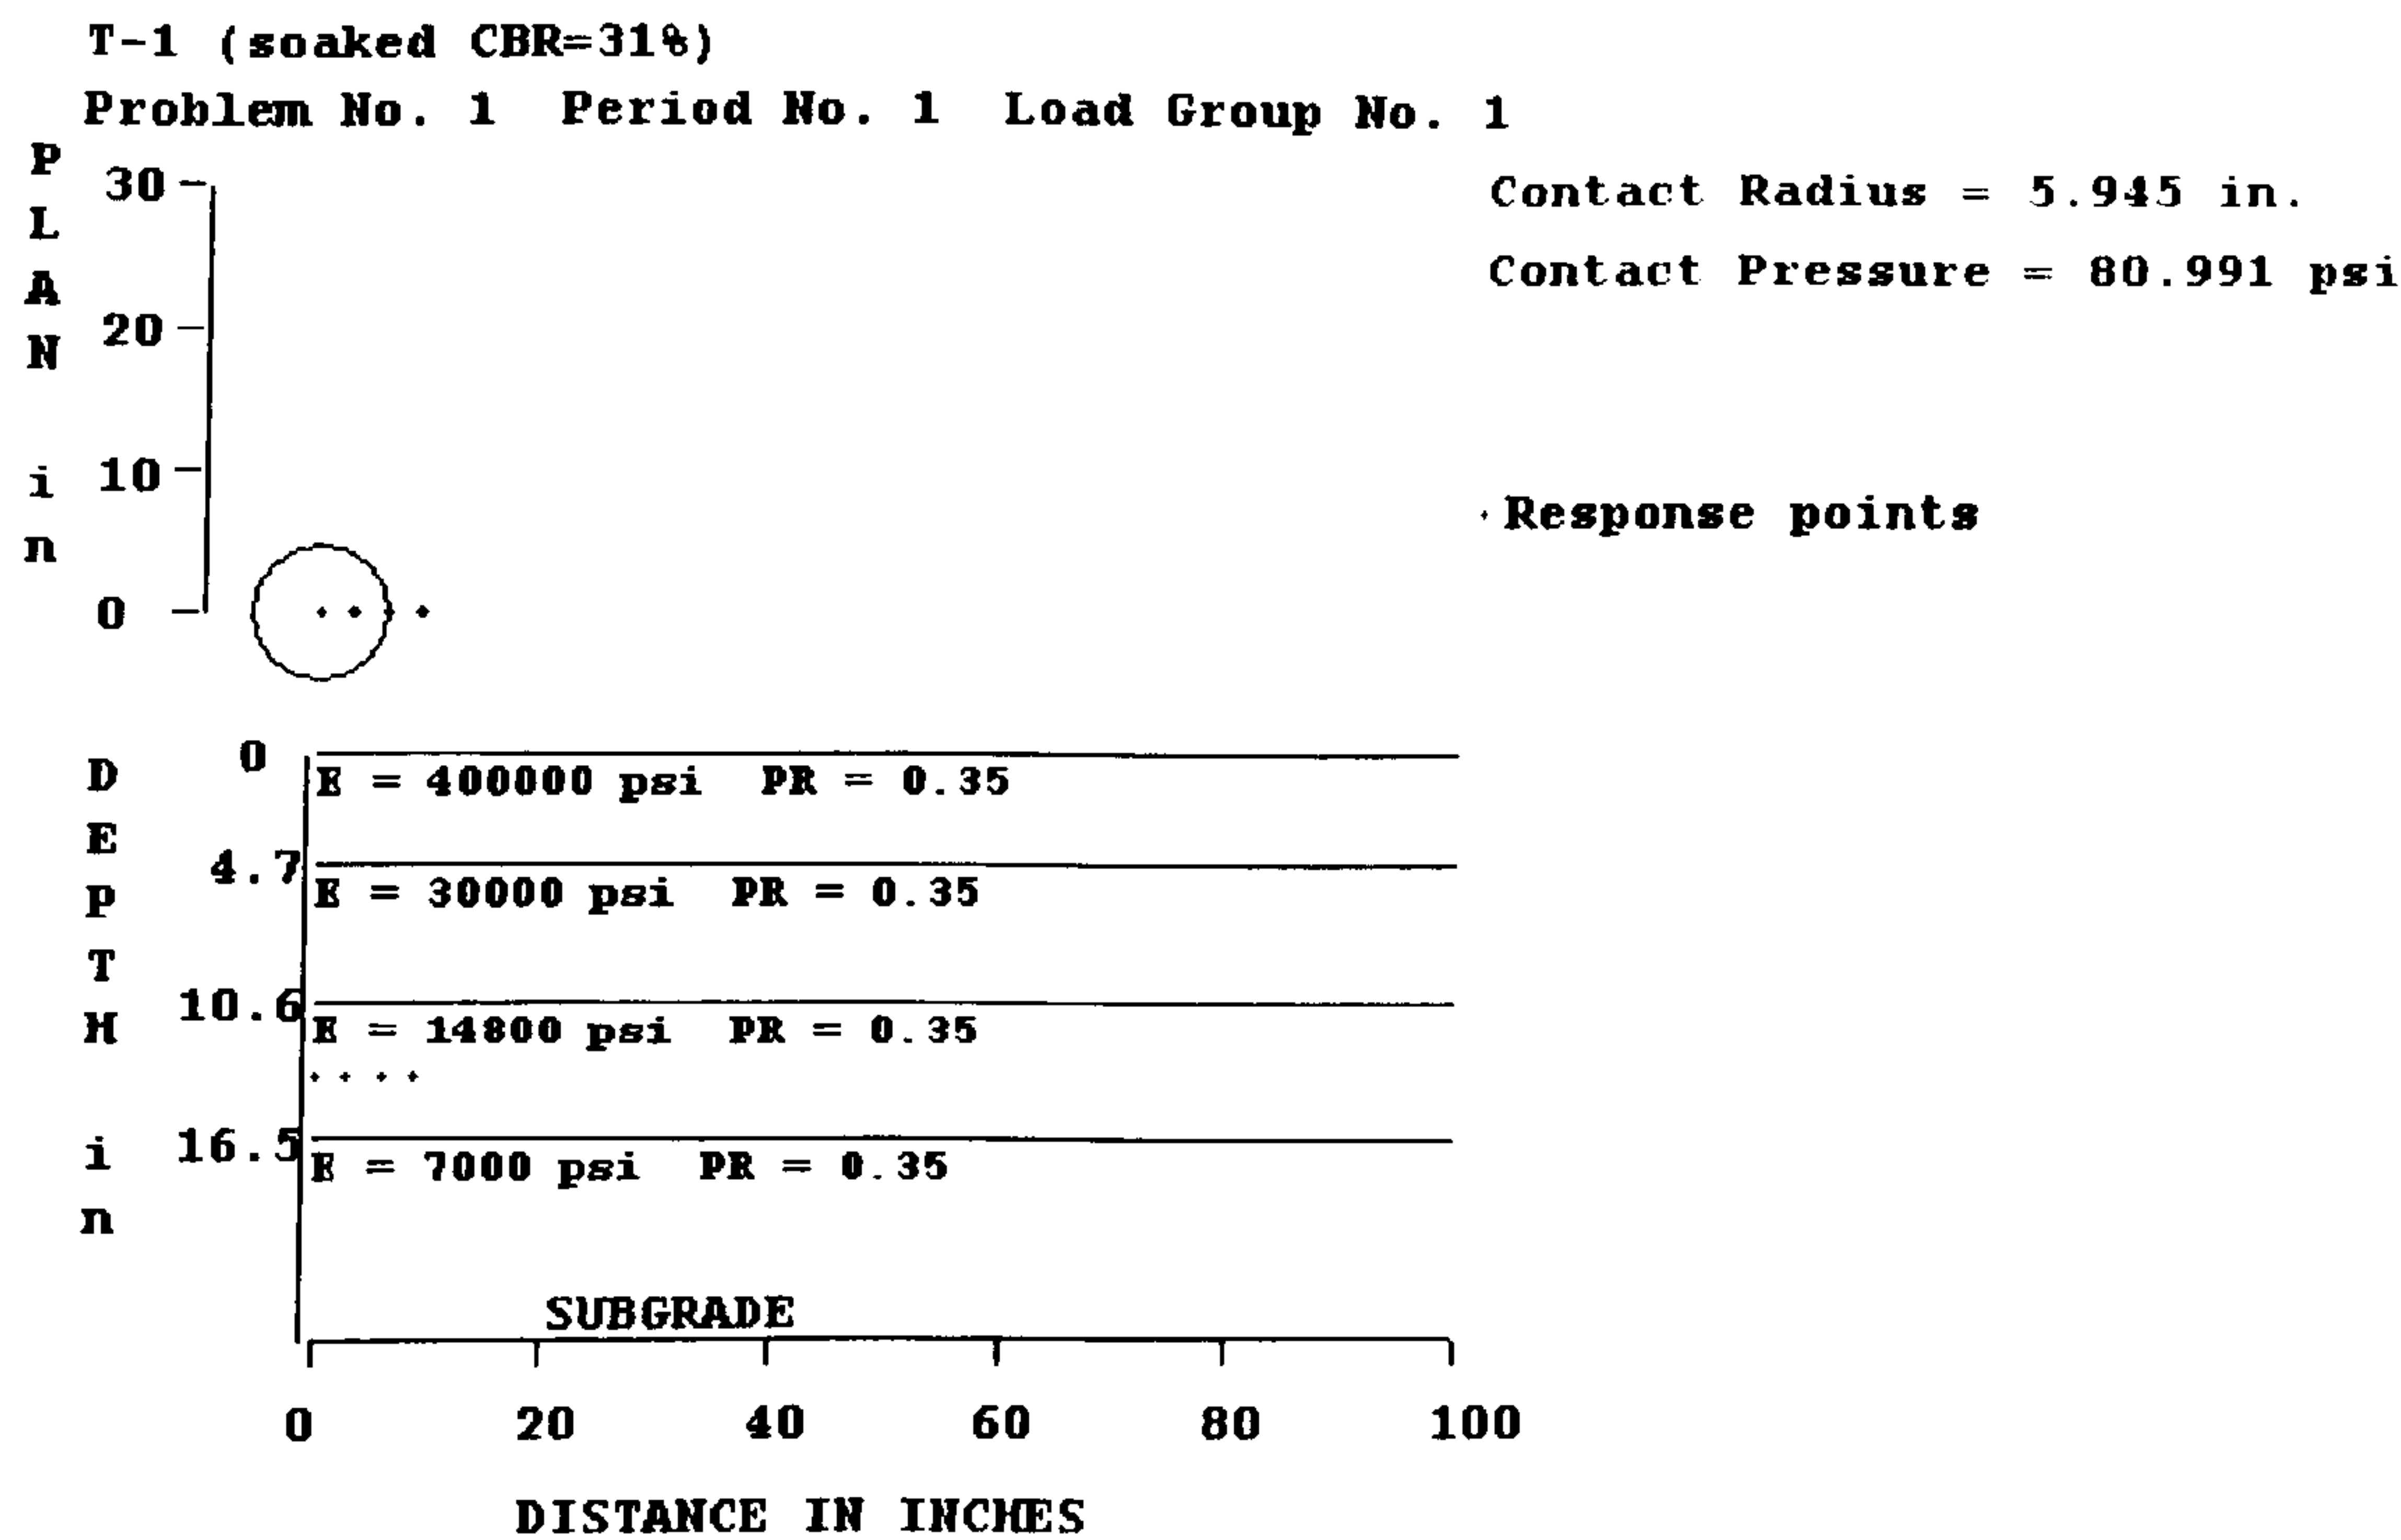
Details of a typical pavement with subbase layer of T-1(soaked condition)
